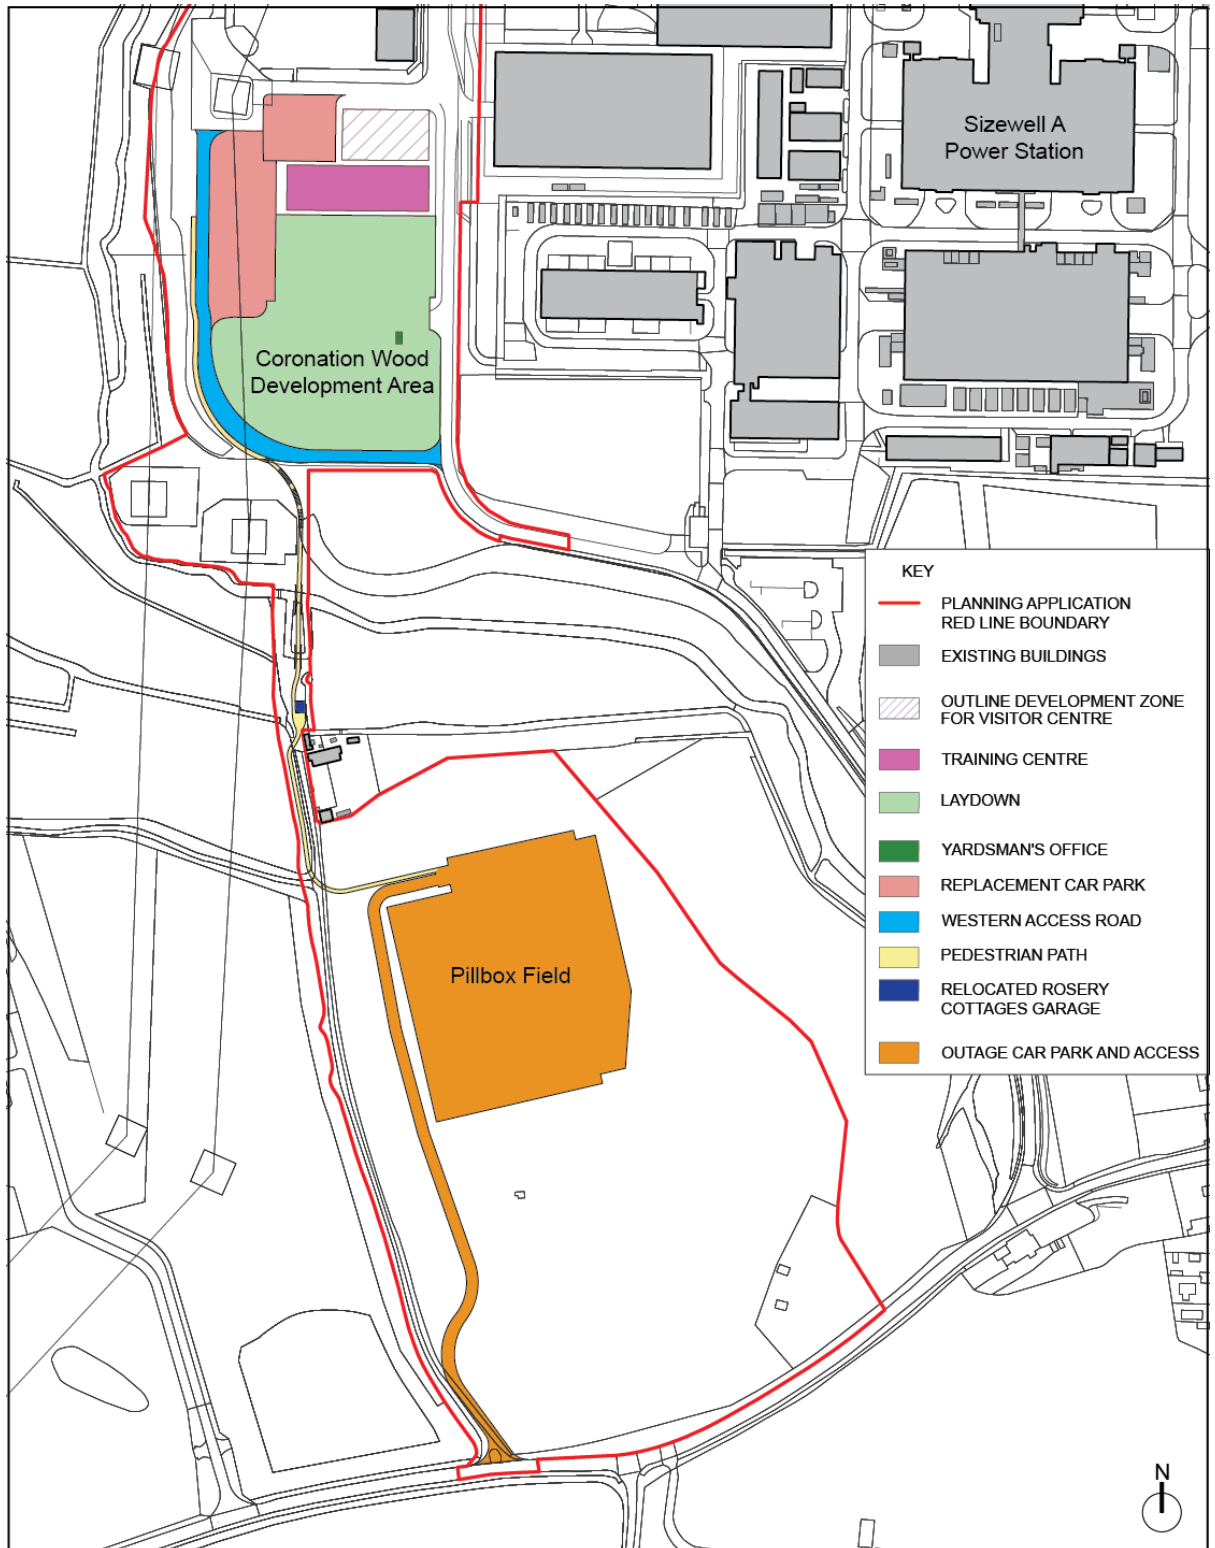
Proposed Location of the Pillbox Field Outage Car Park Facility
